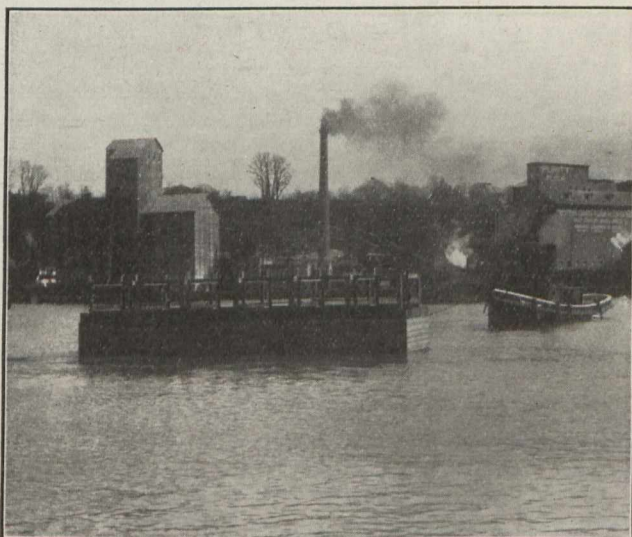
shows the crib work being floated to the dock to receive concrete.
